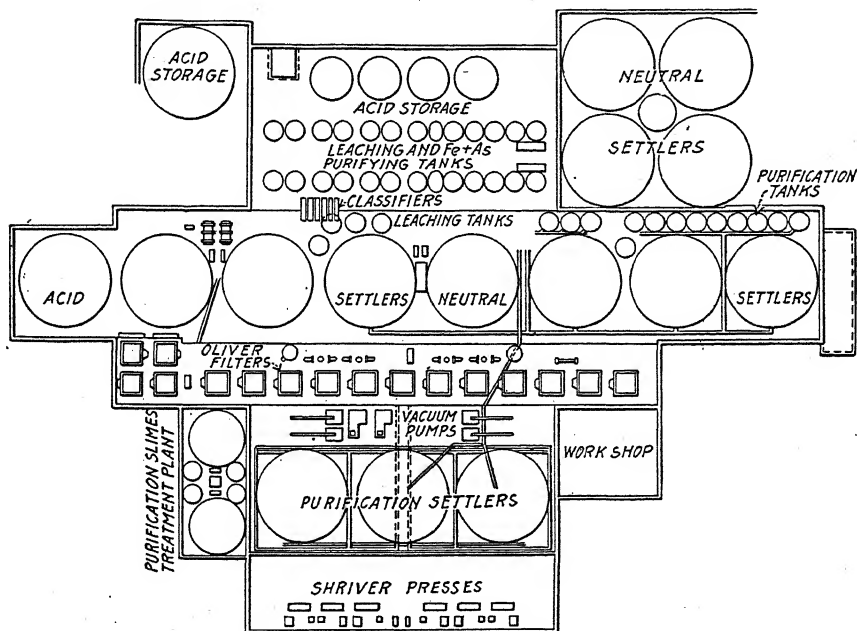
GENERAL PLAN OF 150-TON LEACHING BUILDING.
